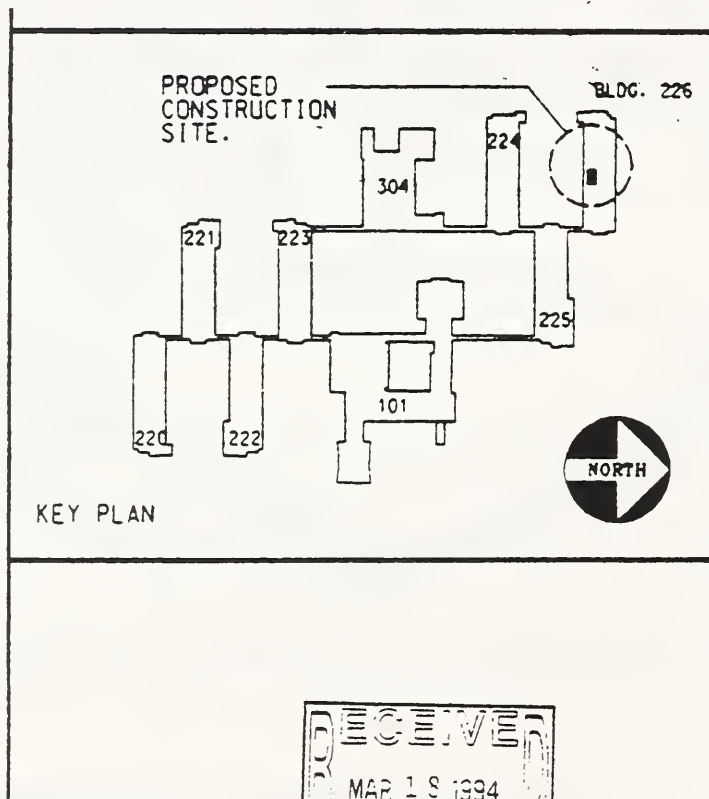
Key Plan & Notes on Isolation Slab Conditioning System
